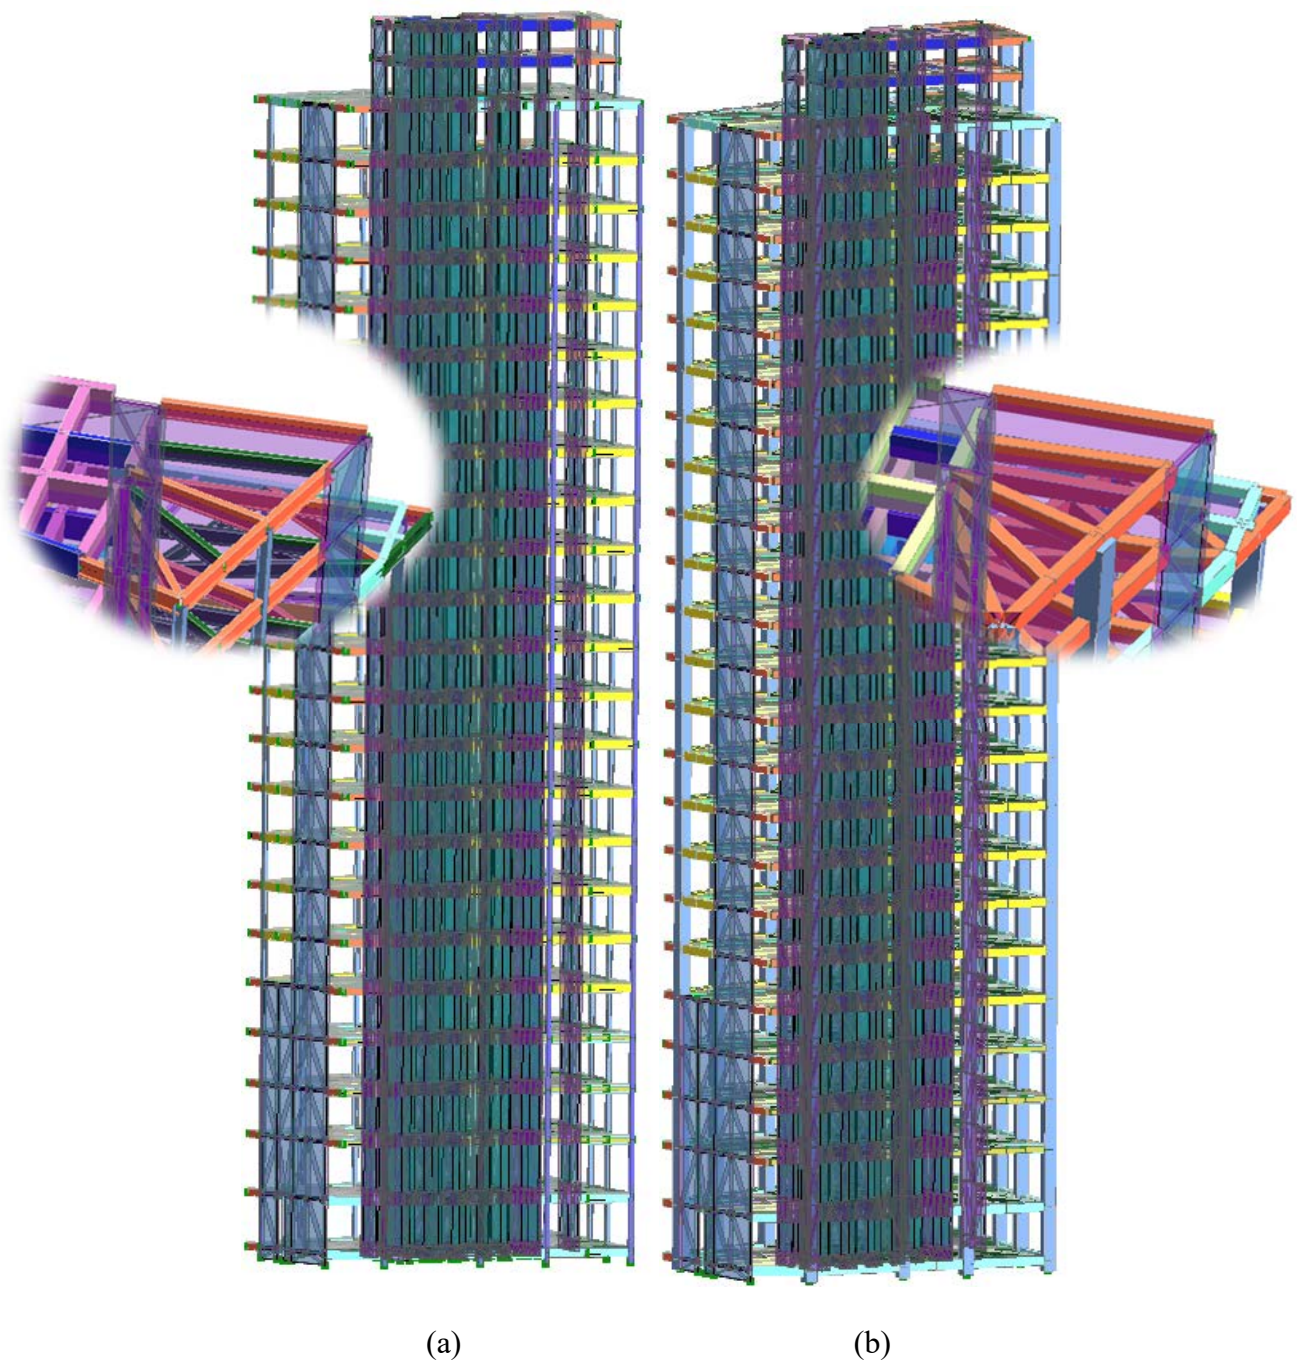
1 Configuration of Commercial Building Models (a) Steel Building and
